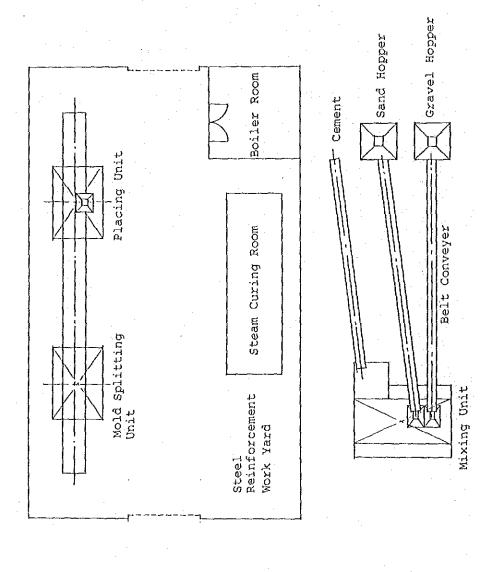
PLAN OF PRECAST CONCRETE PLANT
